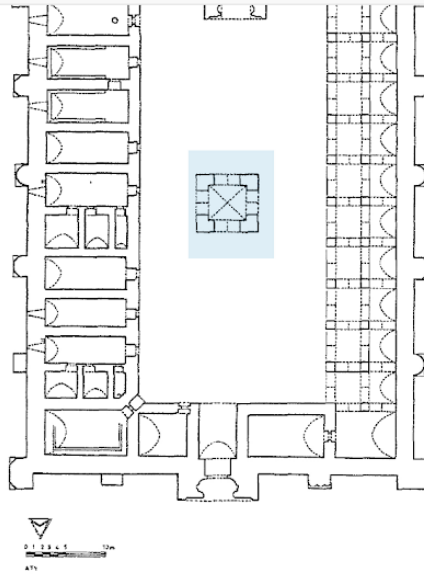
Aksaray Sultan Han (1229) on Konya-Aksaray Road. Reconstruction plan (revised Erdmann plan).
